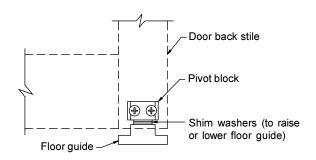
Installation of Door (SX) Bottom Pivot Assembly for Full Breakout Application
